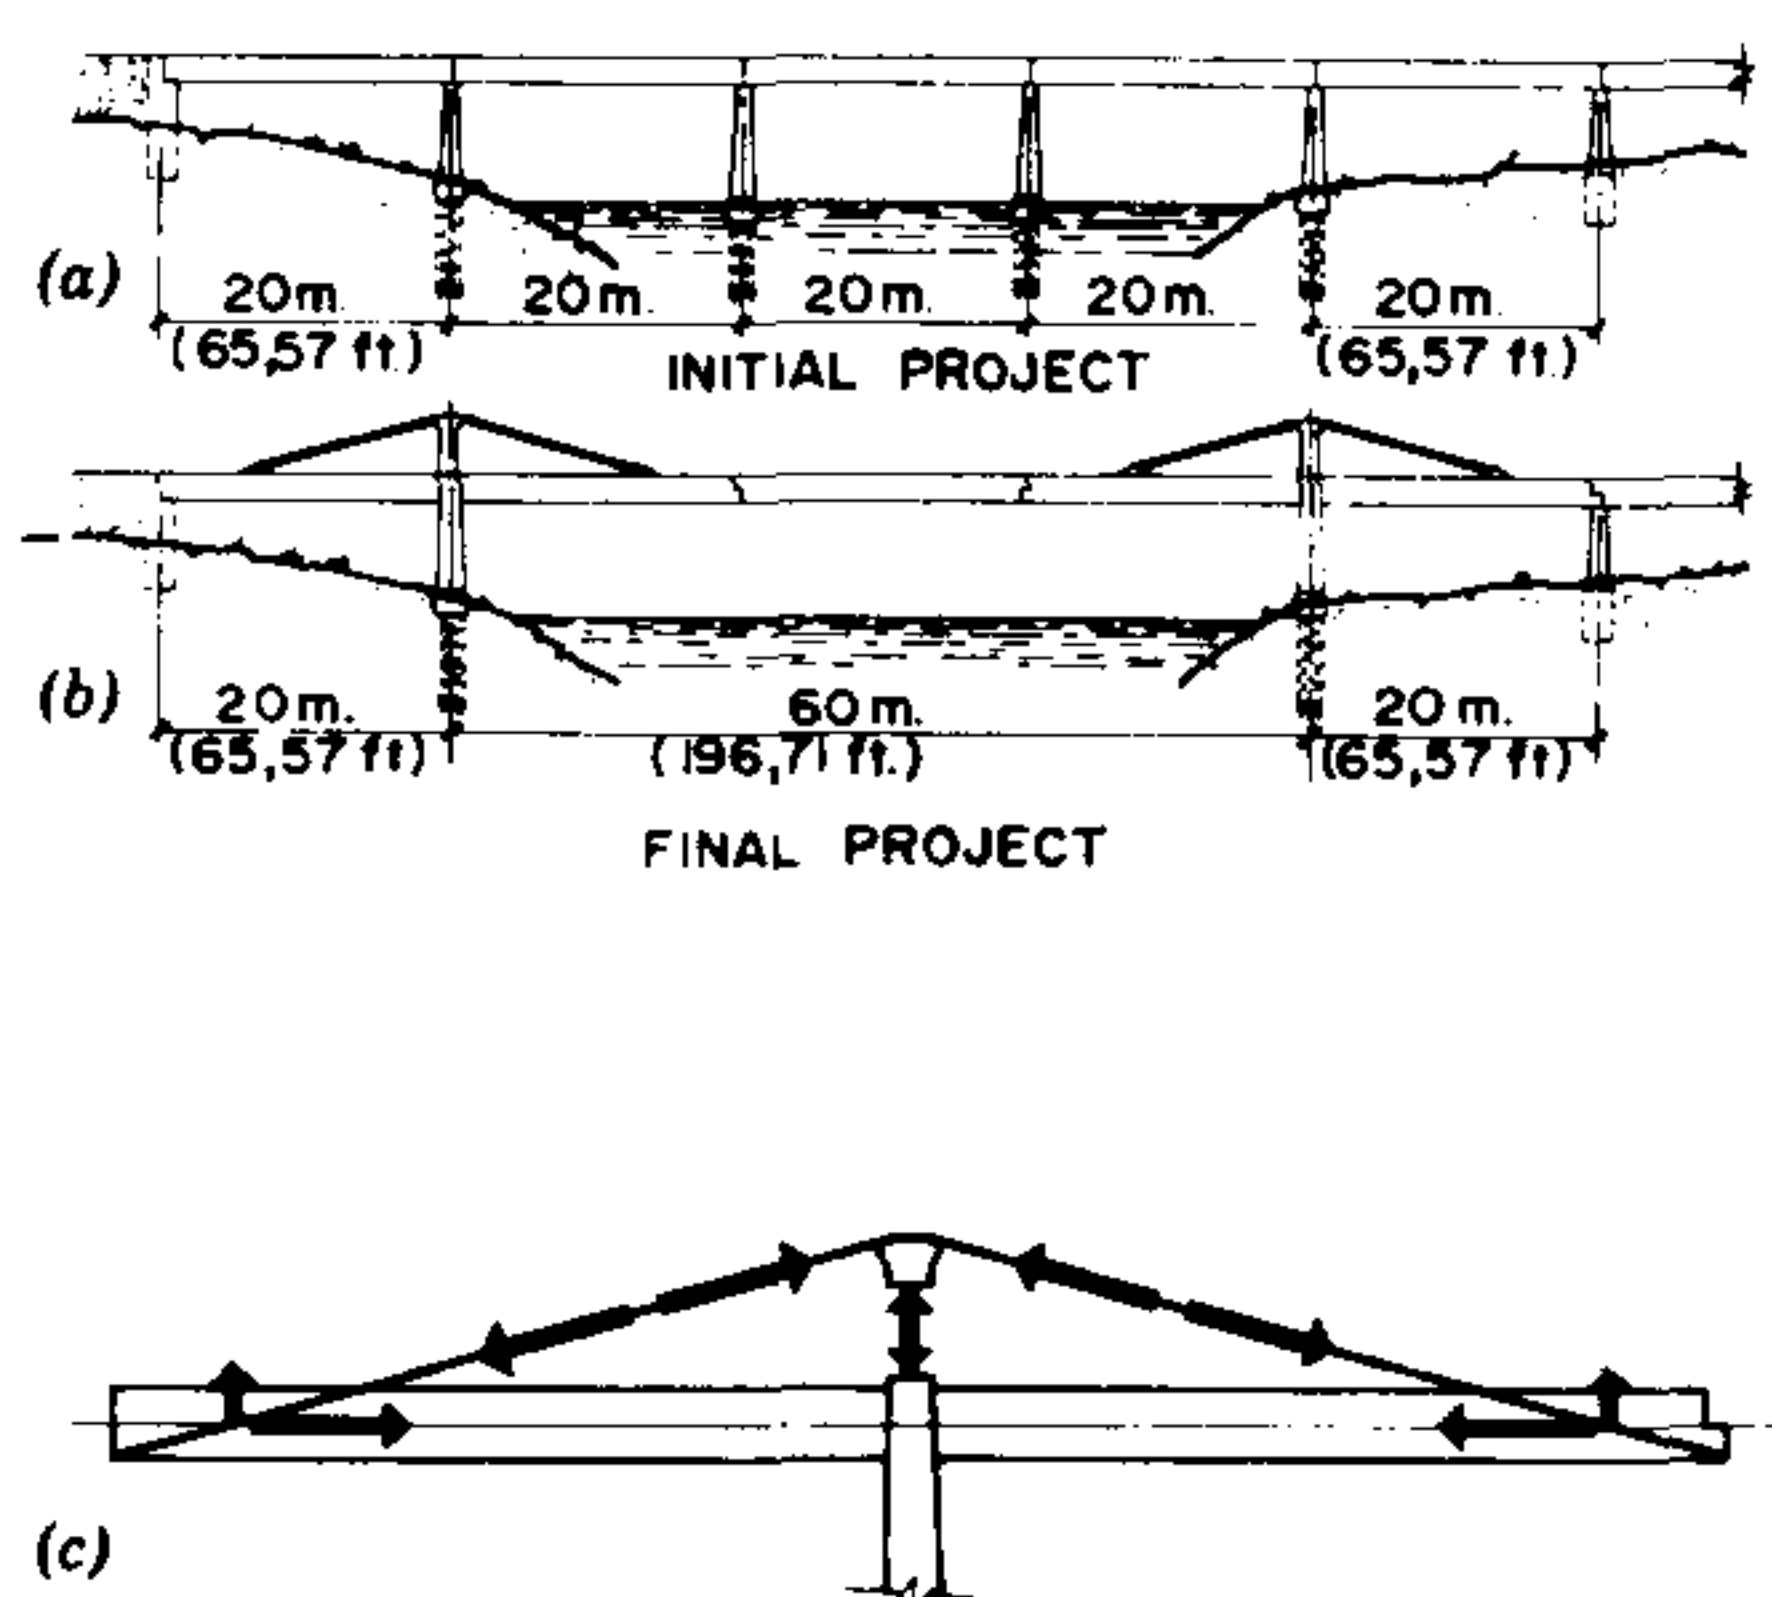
Tempul Aqueduct: (a) Initial Plan; (b) Completed Project; (c) Detail of Tower and Deck
